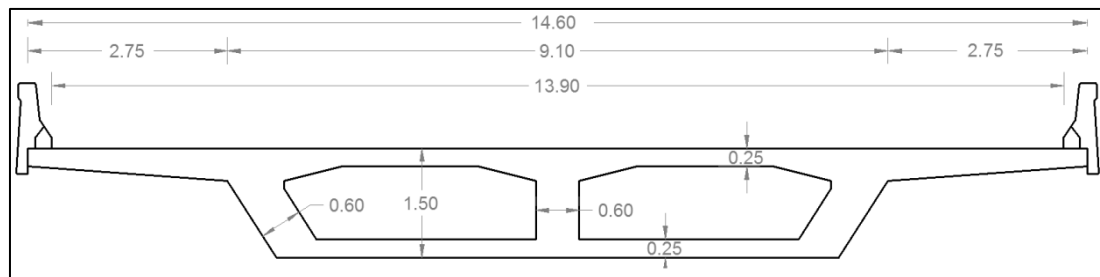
Typical Bridge Deck Cross-section (dimensions in meters)
